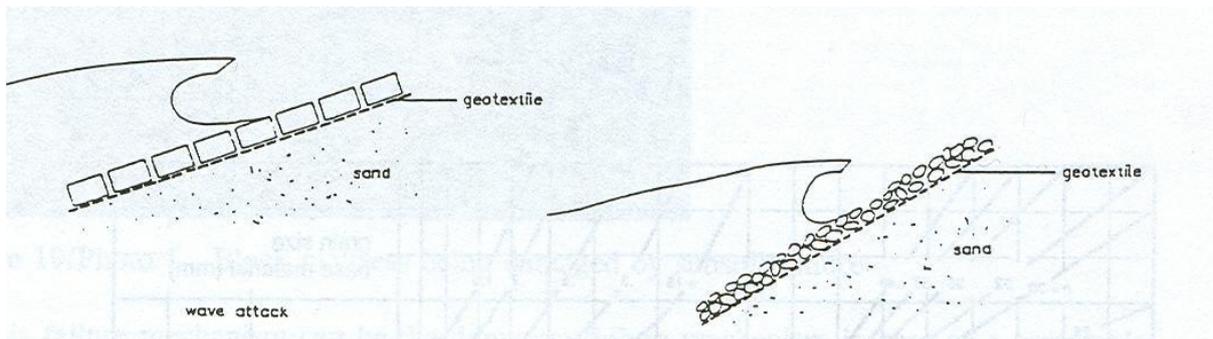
Examples of structures in which geometrically sandtight structures are necessary (Source: Klein Breteler & Bezuijen, 1998)
